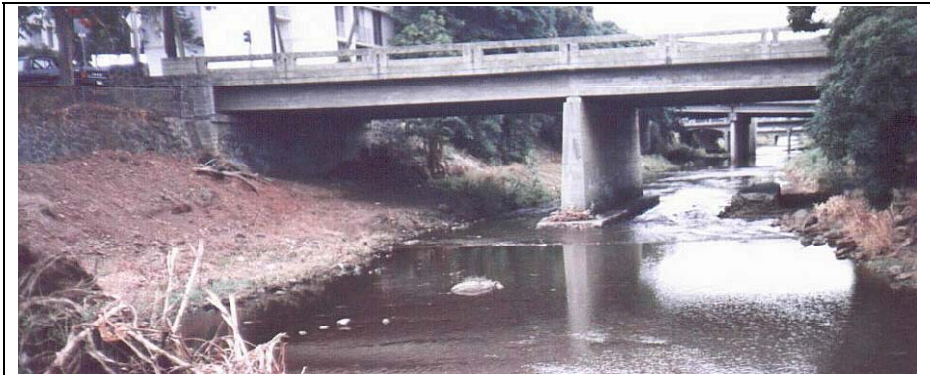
Manoa-Palolo Canal upstream of the Waialae Avenue Bridge, looking downstream towards Kaimuki High School and the Ala Wai Canal. The four bridges can be seen in the photo. The best maintenance road/bike path route is on the left.
